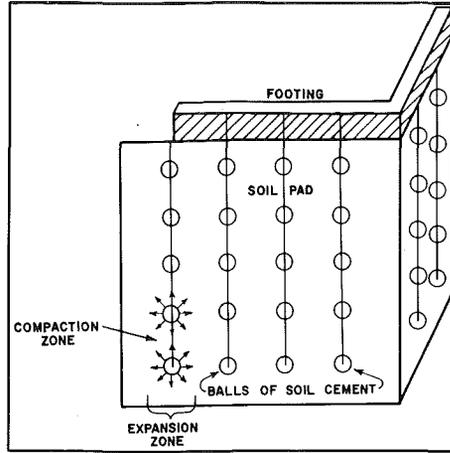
A demonstration of the soil-cement injection method of stabilizing damaged foundations.
